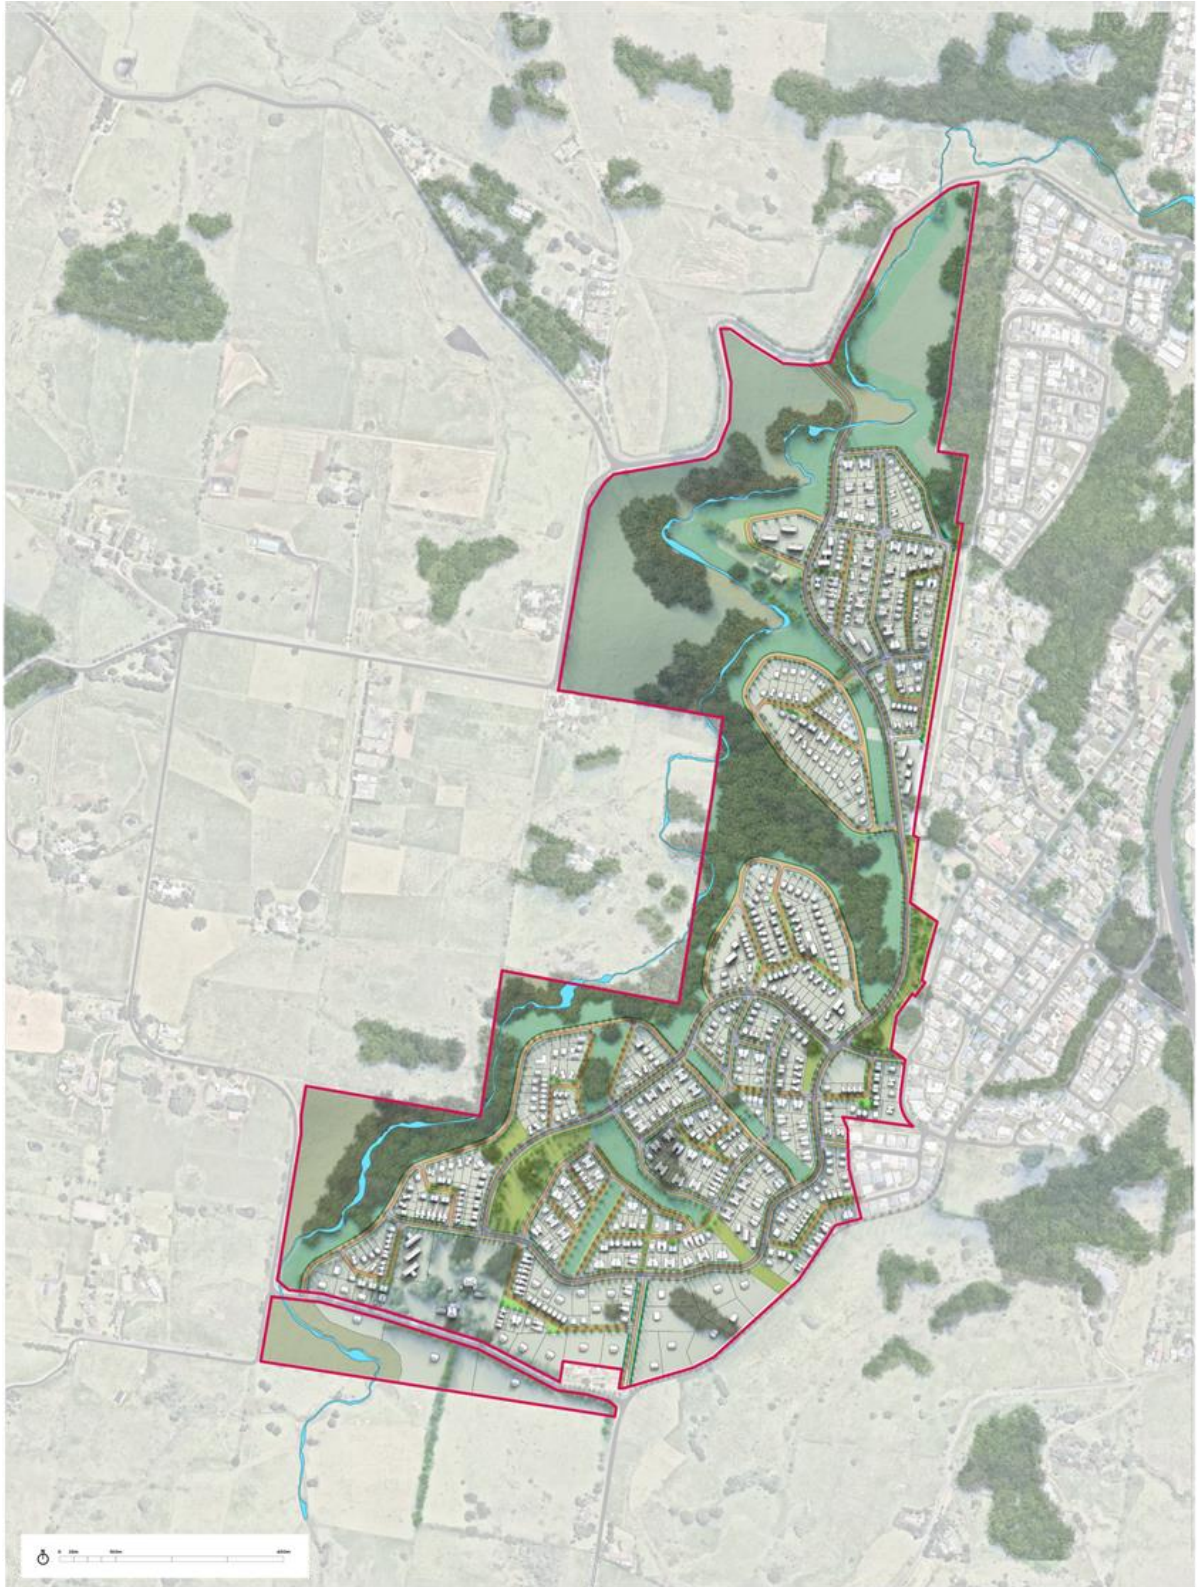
INDICATIVE LAYOUT PLAN
